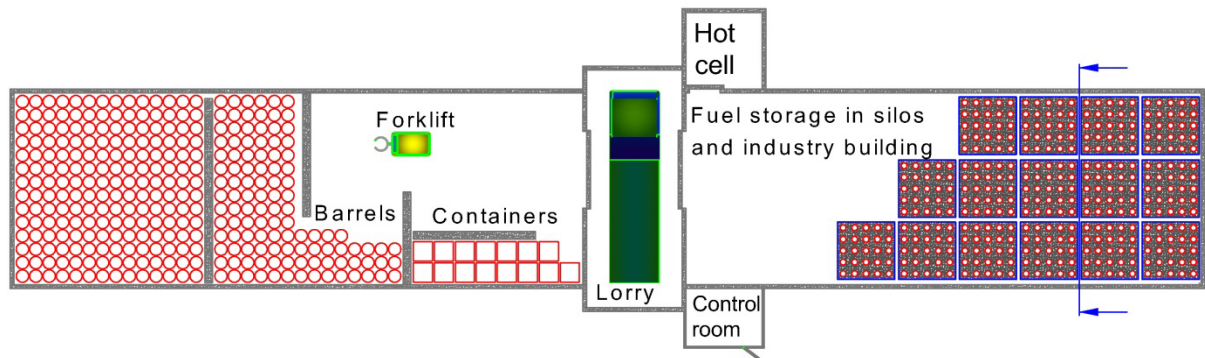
Plan view for fuel storage in a silo contained in an industry building.
